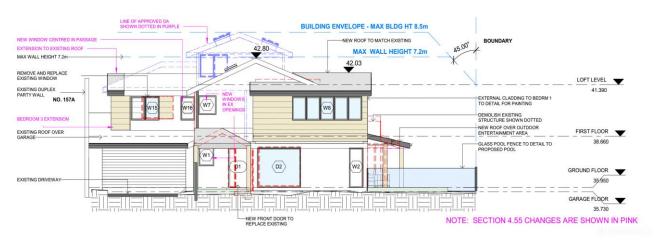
Side Boundary Envelope viewed from Eastern elevation
